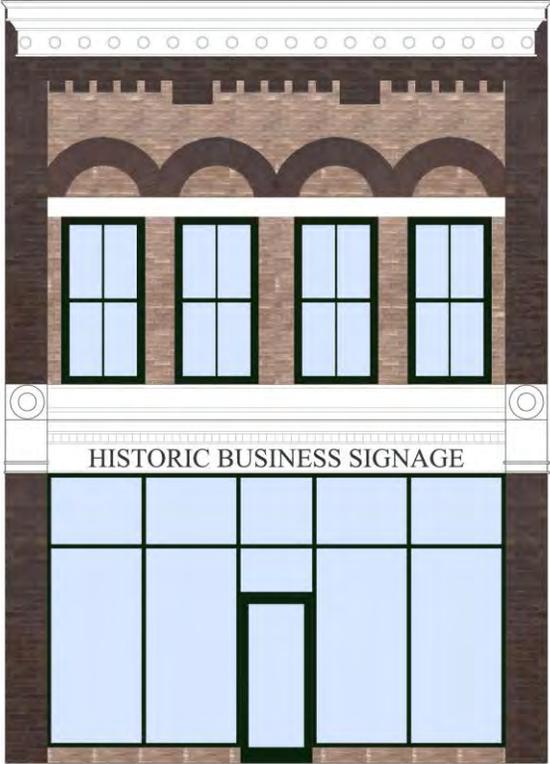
façade improvements with new storefront, upper level windows, and restored masonry
